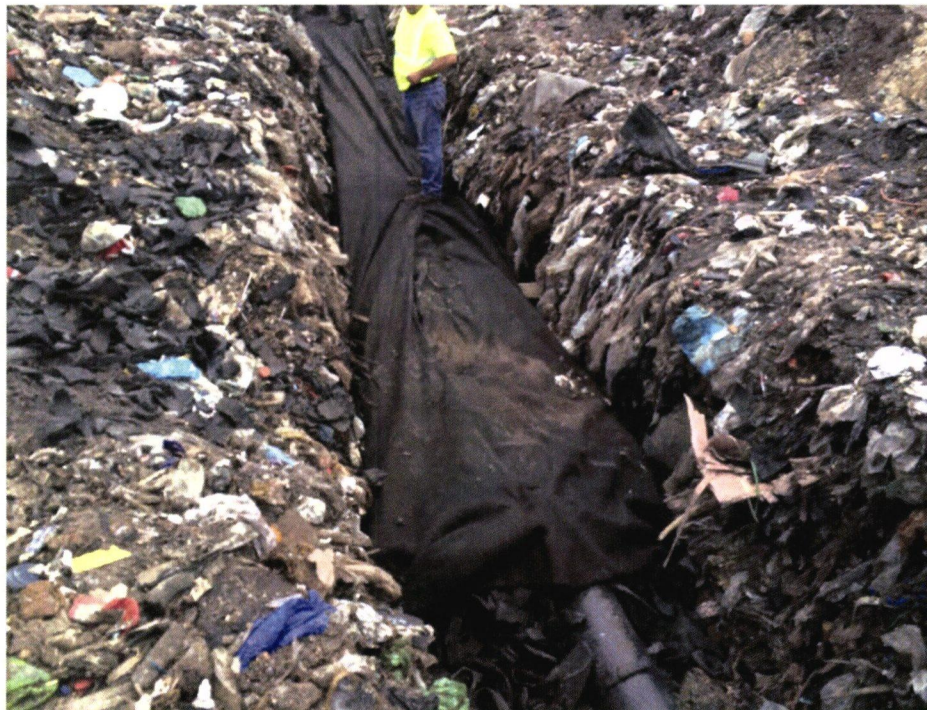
Placing horizontal gas collector into excavated trench (typical).
